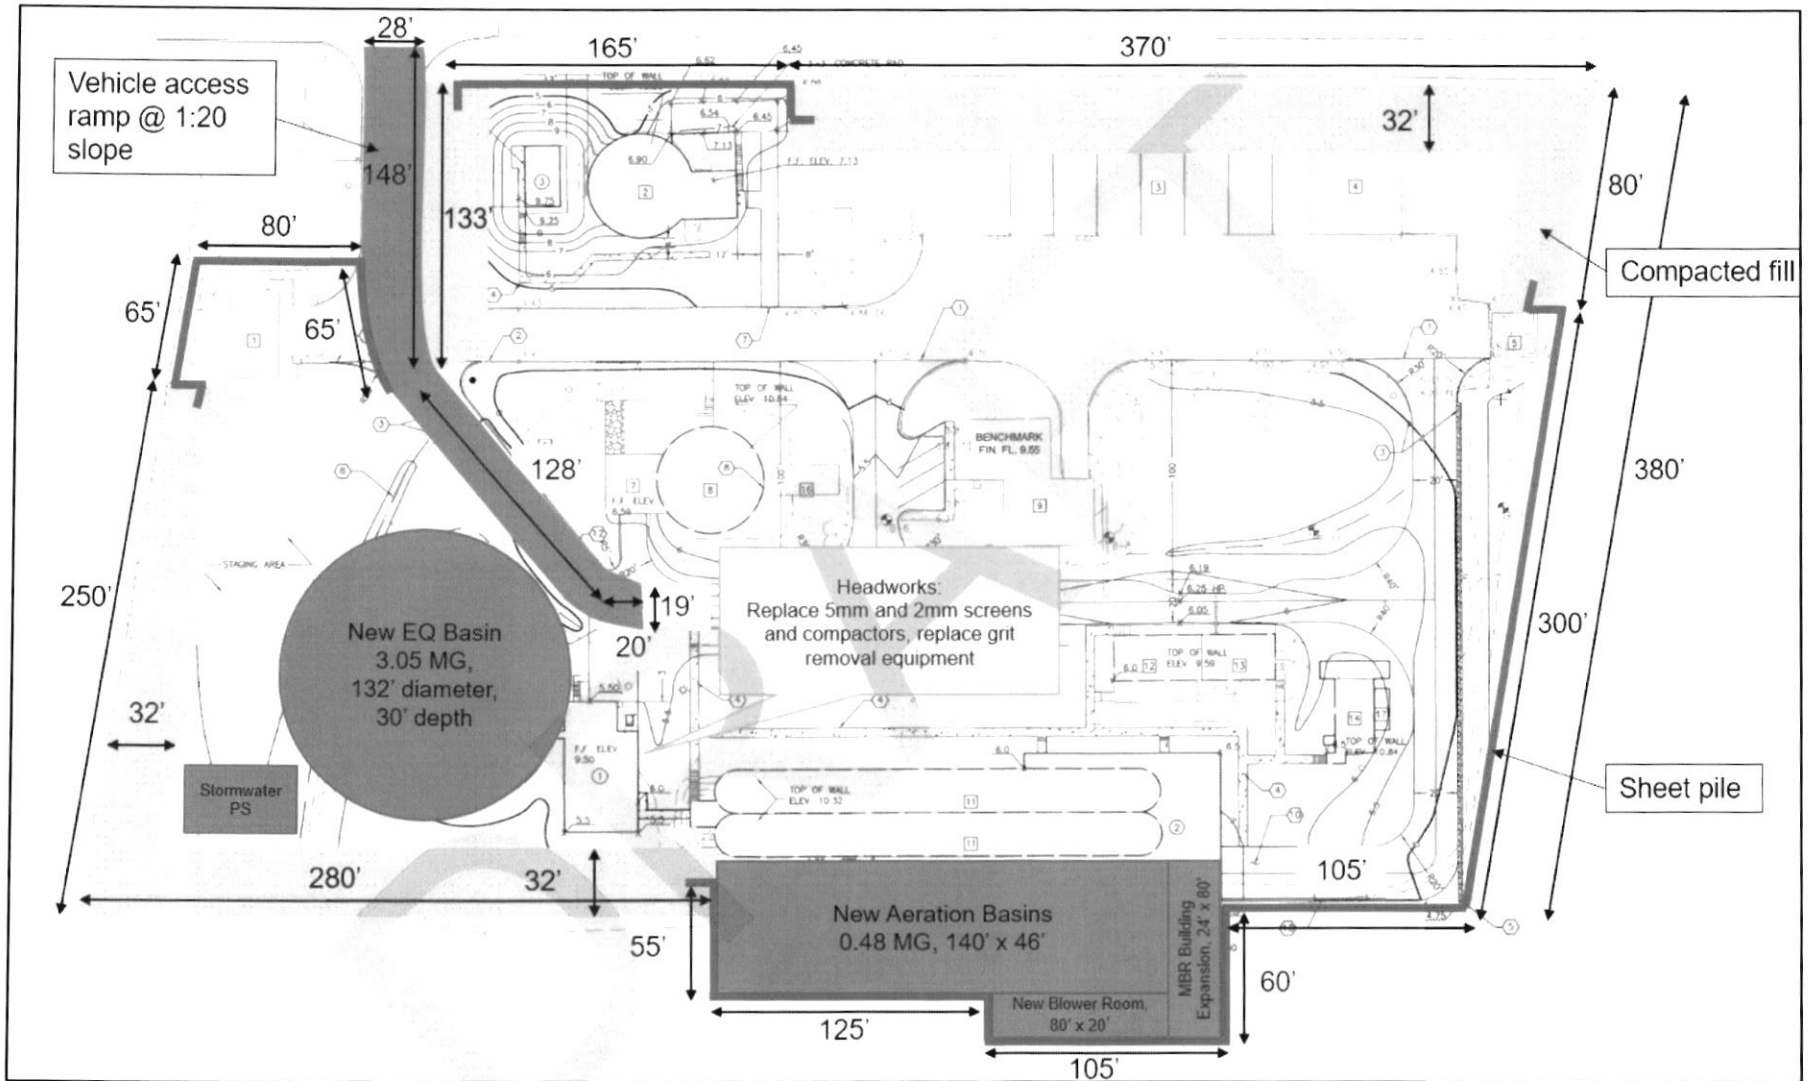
Option 1, Perimeter Flood Barrier Concept Arrangement, Plan View
